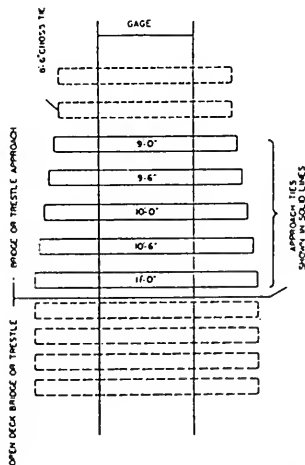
Bridge Approach Transition (According to AREA Portfolio 1952).
